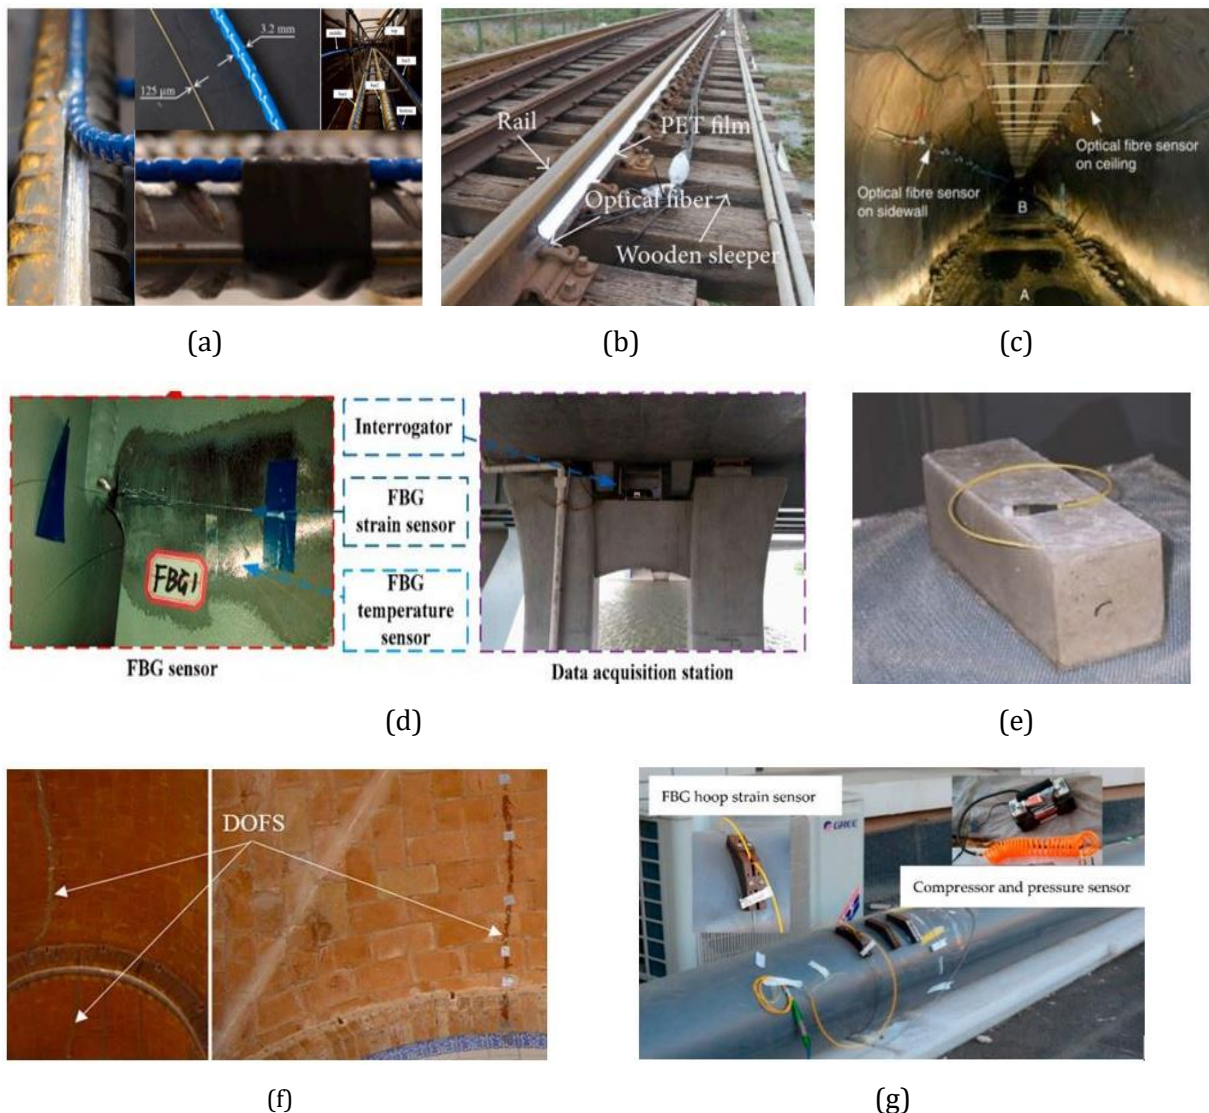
Implementation of FOS in various forms for system of civil SHM a) Crack detection in rebar [47] b) Monitoring rail tracks [48] c) Strain monitoring in underground mining tunnel [49] d) Monitoring steel bridge crossing in china [50] e) Embedded sensors in concrete element for SHM [41] f) Crack detection in masonry walls [51] g) Monitoring leakage in the water pipeline [52]
